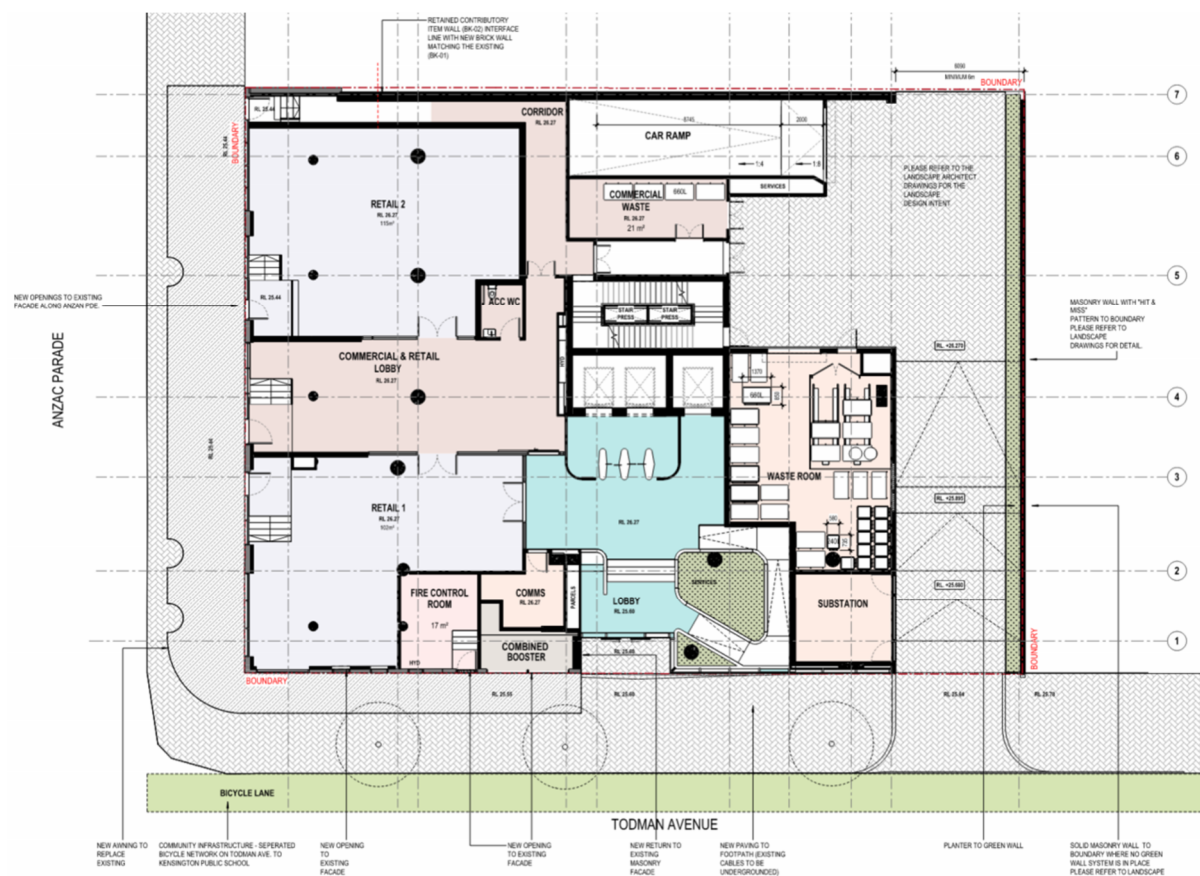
Proposed Ground Floor Plan (Source: Applicant)
